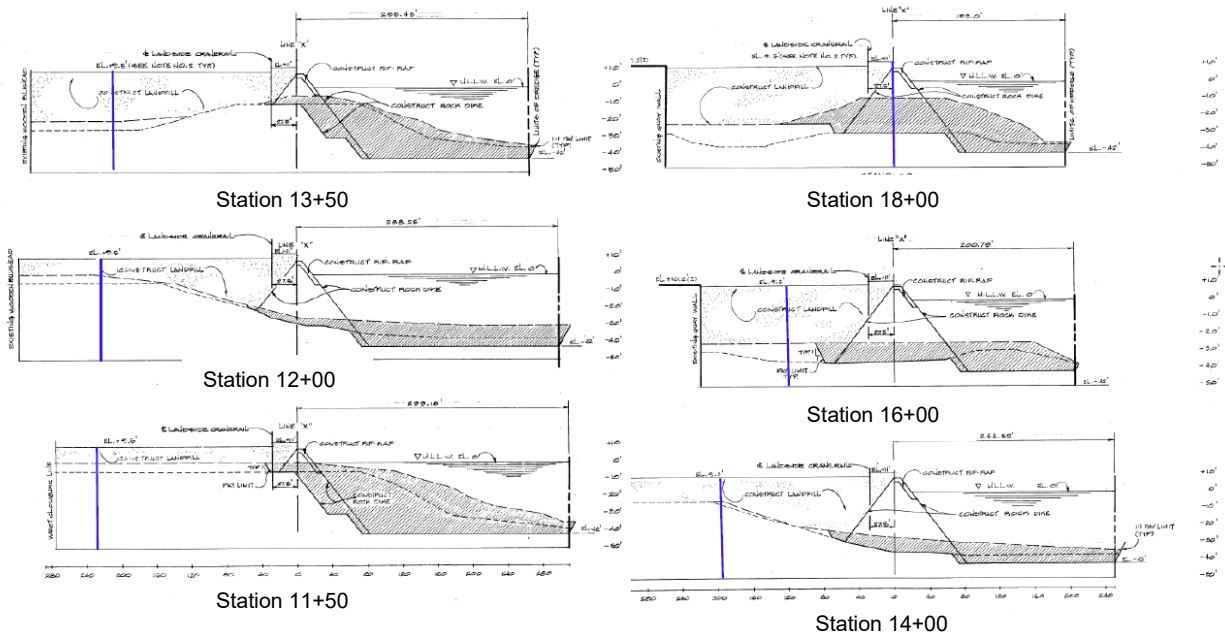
Proposed Bulkhead Wall Location at Various Stations
